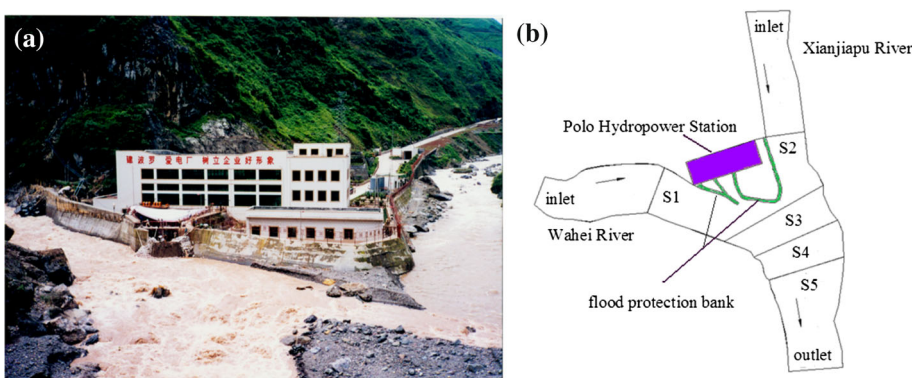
a Field photograph of original Polo Hydropower Plant; b schematic layout of rivers
